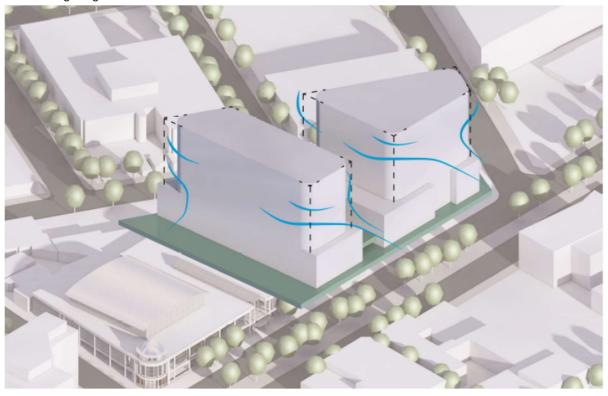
Illustration showing curving of the buildings to assist in reducing wind loads (Source: Plan DA023 at Appendix 2)
